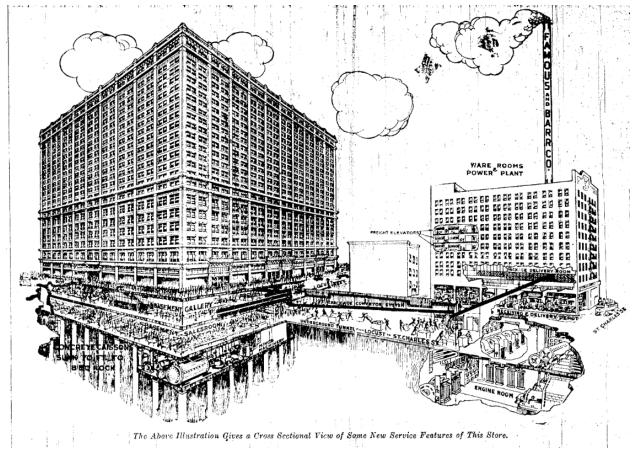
Layout of Building and Utilities (Famous and Barr Company, 1913)
